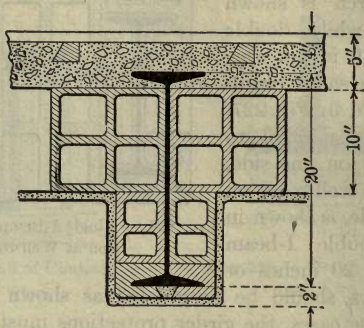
Single I-Beam Girder Protection, U. S. Court House & P. O., Los Angeles, Cal. ]
